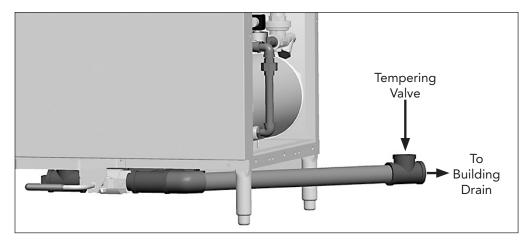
Rack Conveyor DWT outside the machine footprint.
